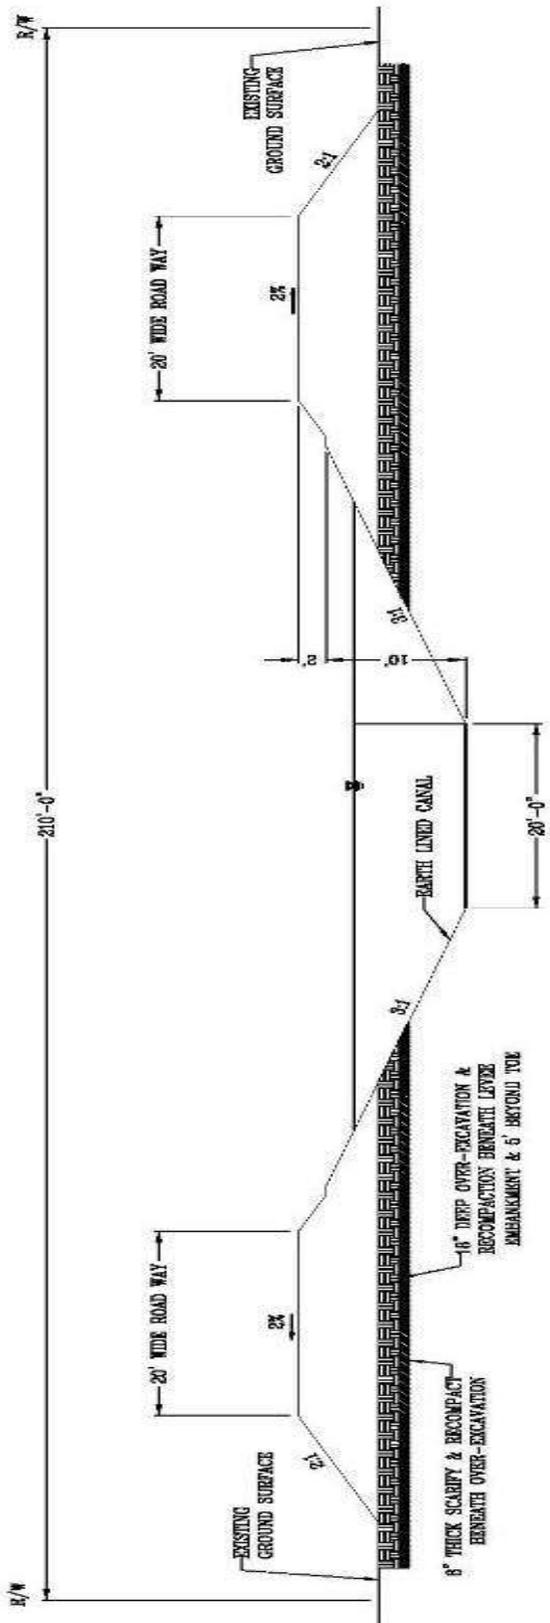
Preliminary Canal Cross-Section with 3:1 Side Slopes
